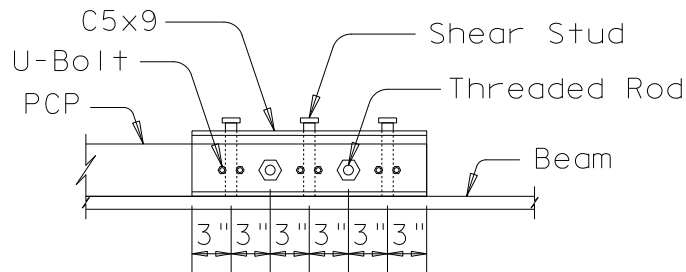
Partial Elevation of Shear Stud Connection PCP Specimen
